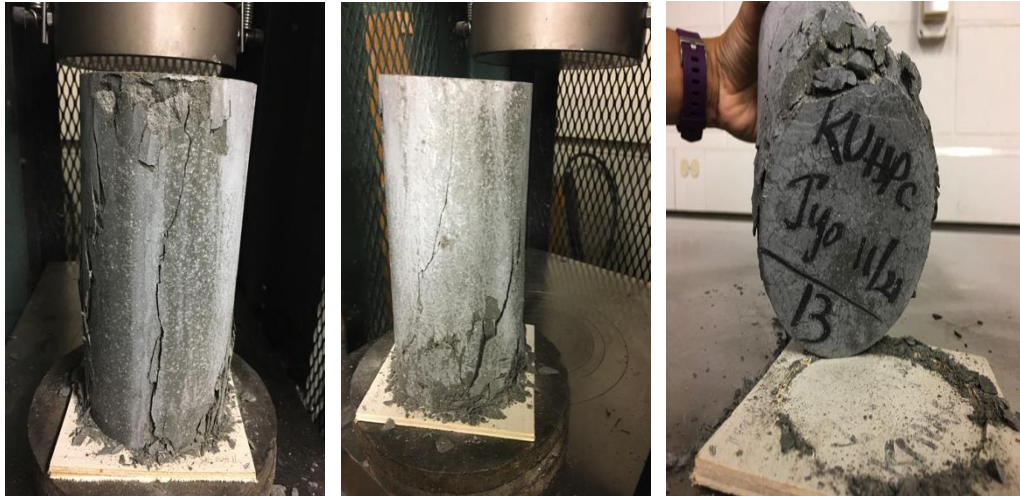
Front, back, and bottom of Sample 3 (left to right)
